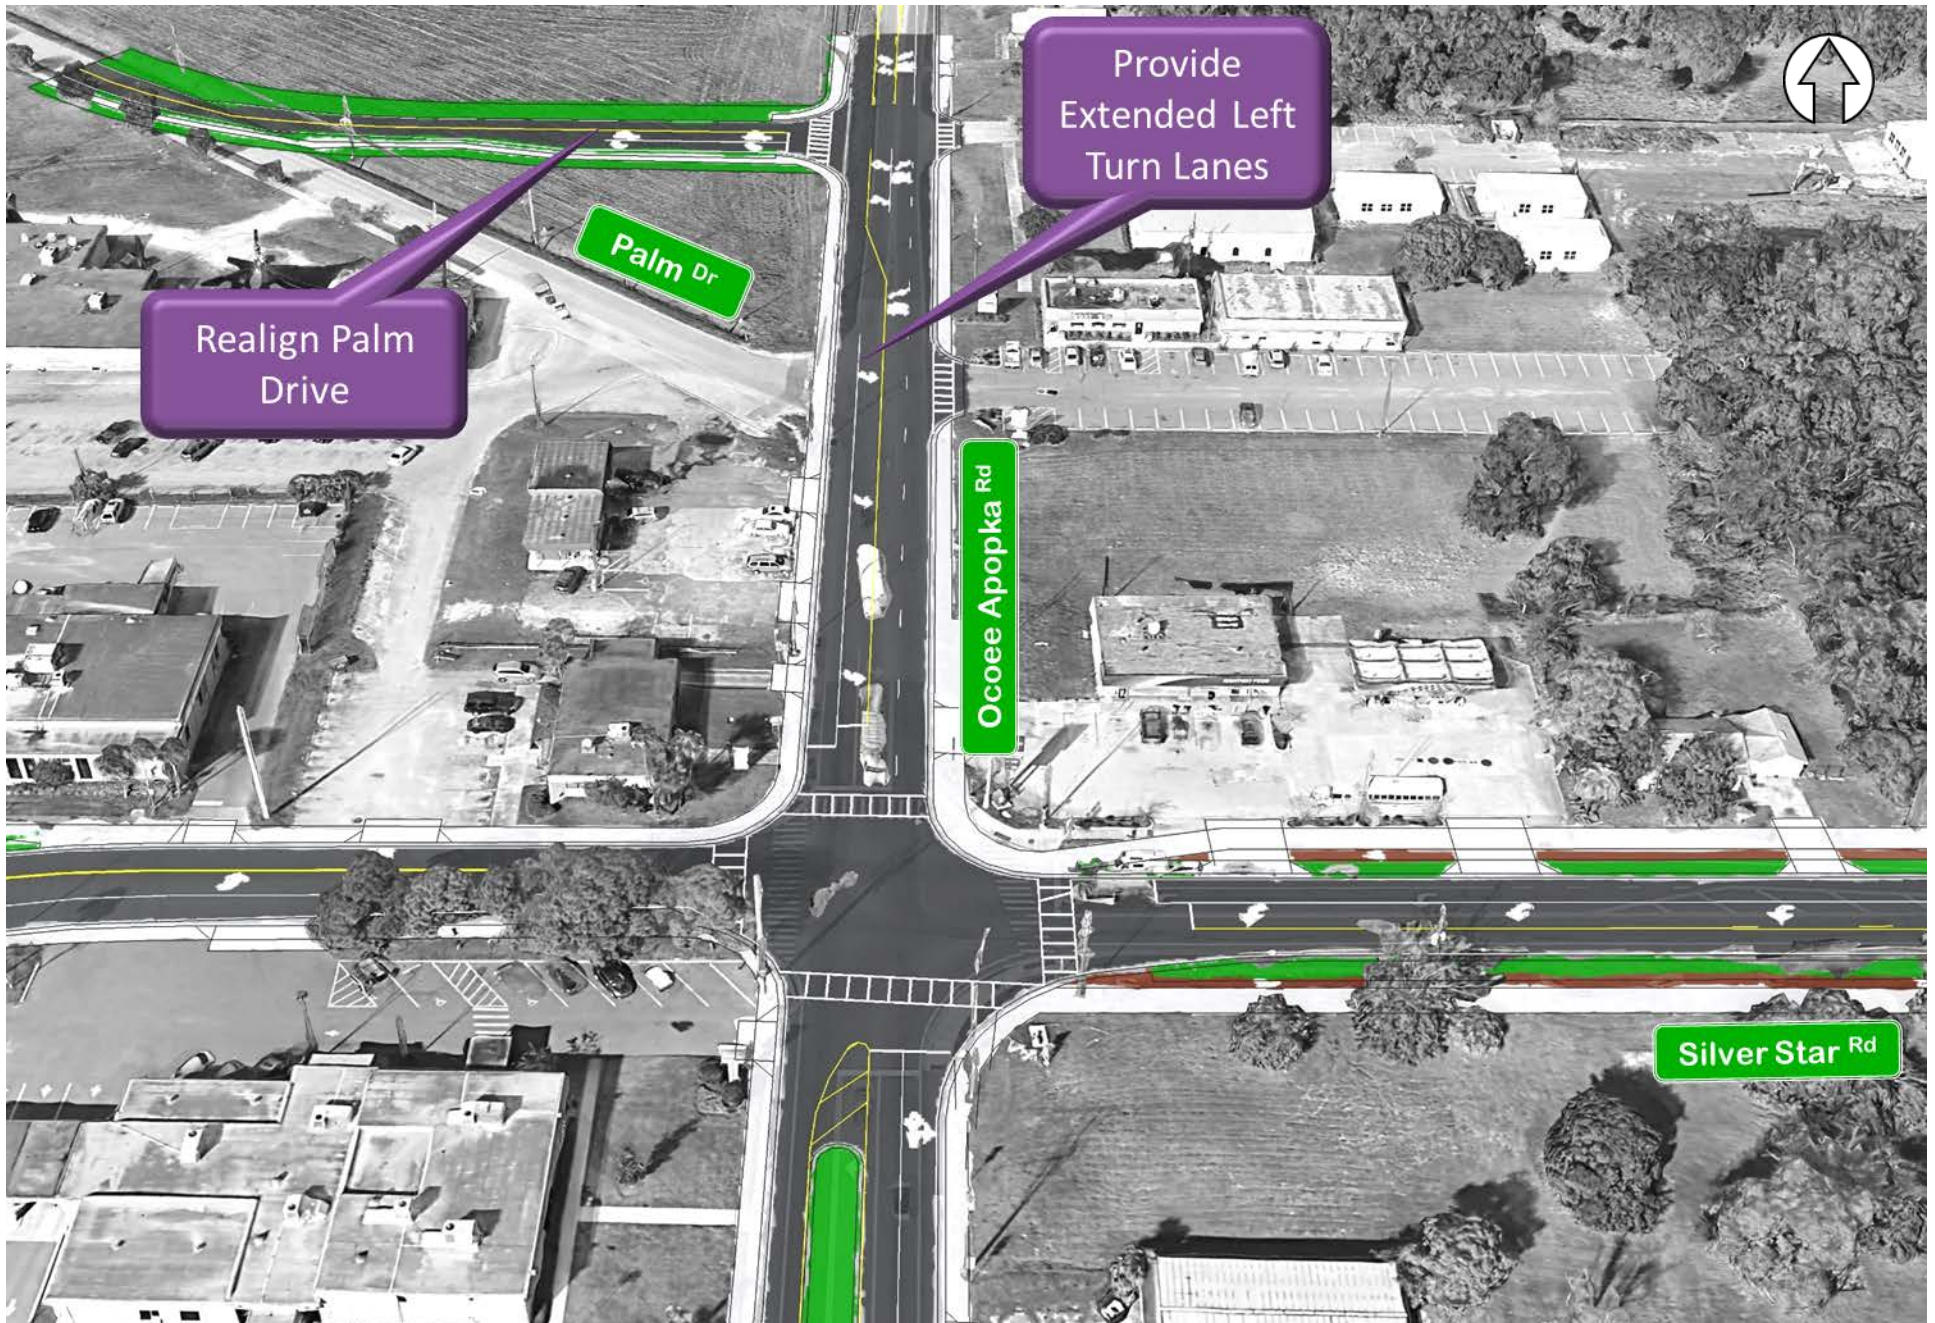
| Concept Plan - Ocoee Apopka Road north of Silver Star Road
